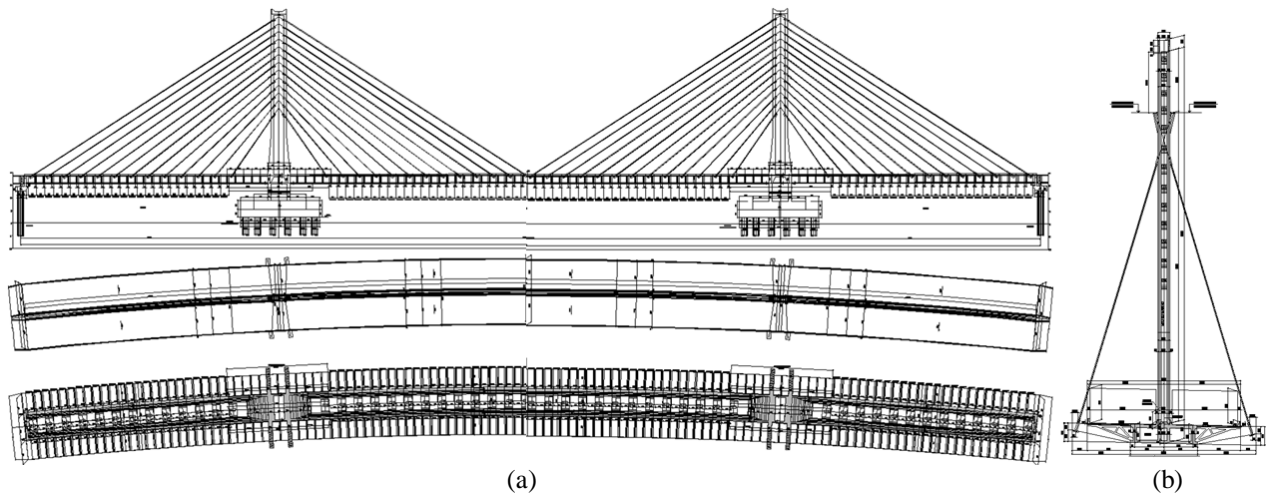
(a) Elevation and plan views of the bridge case example; (b) Deck cross-section and tower. Designers: Enescil Engenharia de Projetos; Contractor: Consórcio Ponte de Laguna: Camargo Correa, Aterpa M.Martins; Construbase.
